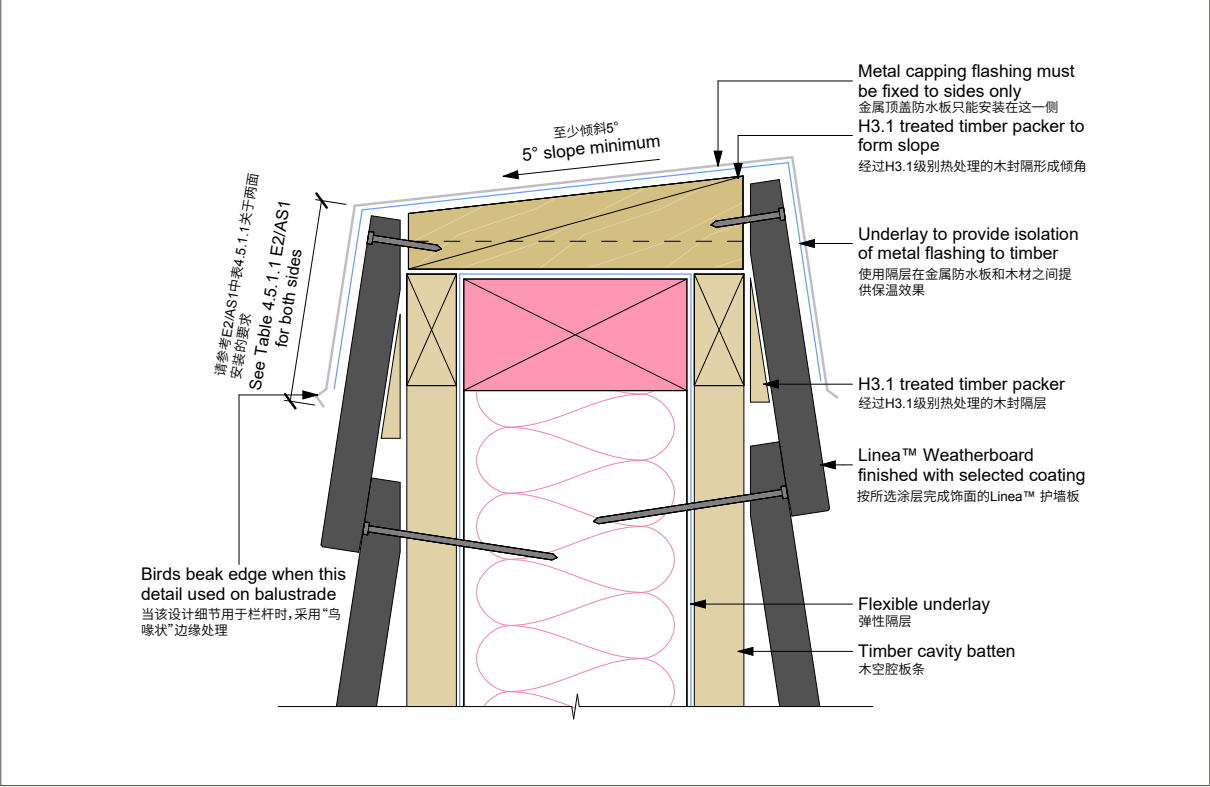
Balustrade to wall junction | 图32: 栏杆到墙体的连接
